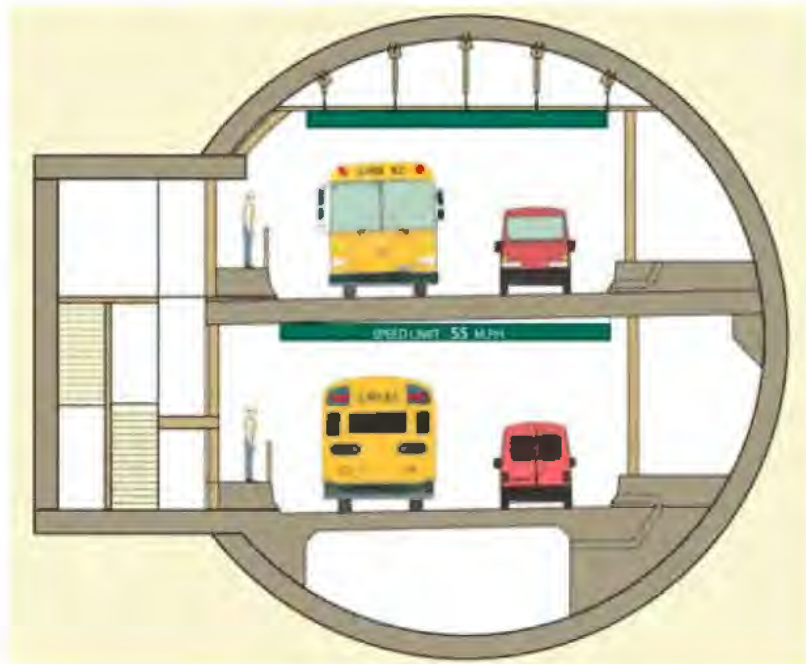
Typical cross-section: Single bore tunnel (stacked roadway) alternative with vertical egress points.
